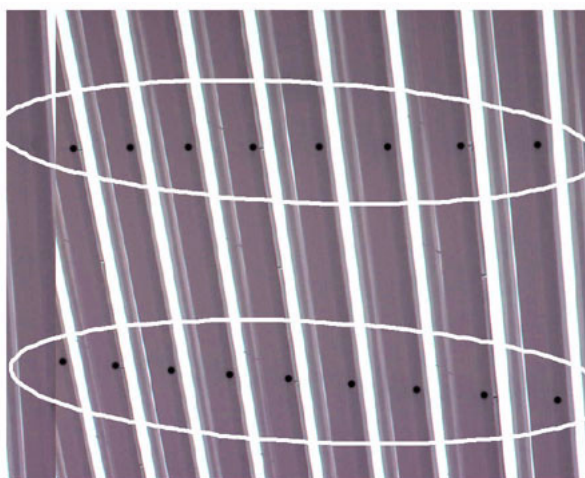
Connection of metal siding to light metal frame with rows of screws (encircled).
